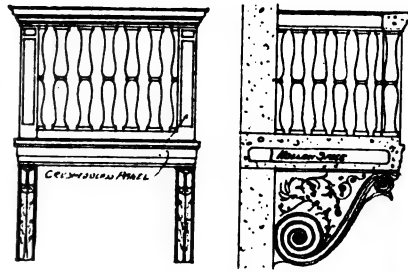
(ABOVE)—FRONT ELEVATION AND SECTION OF CONCRETE BALCONY
